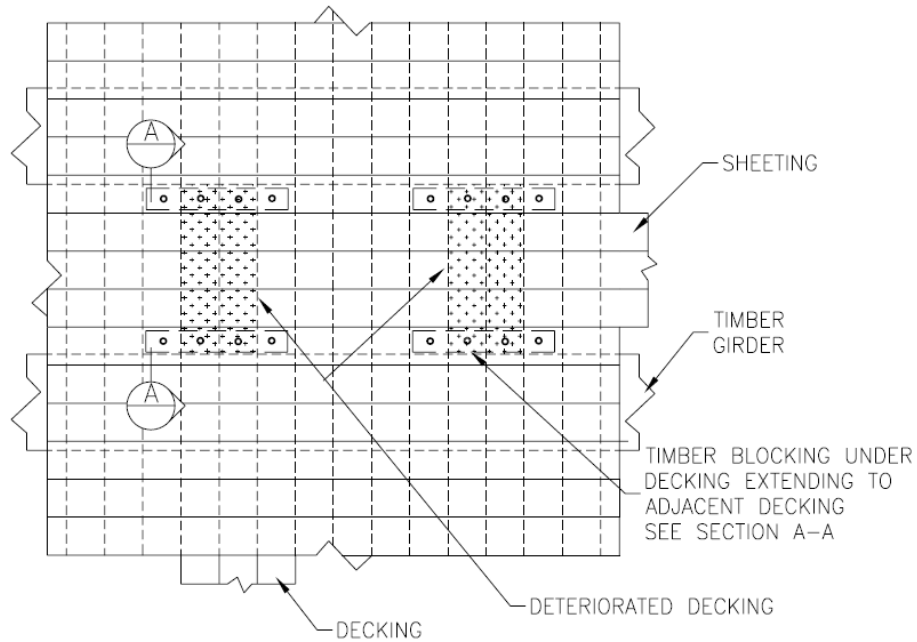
Local replacement of timber decking and added sheeting – plan view
